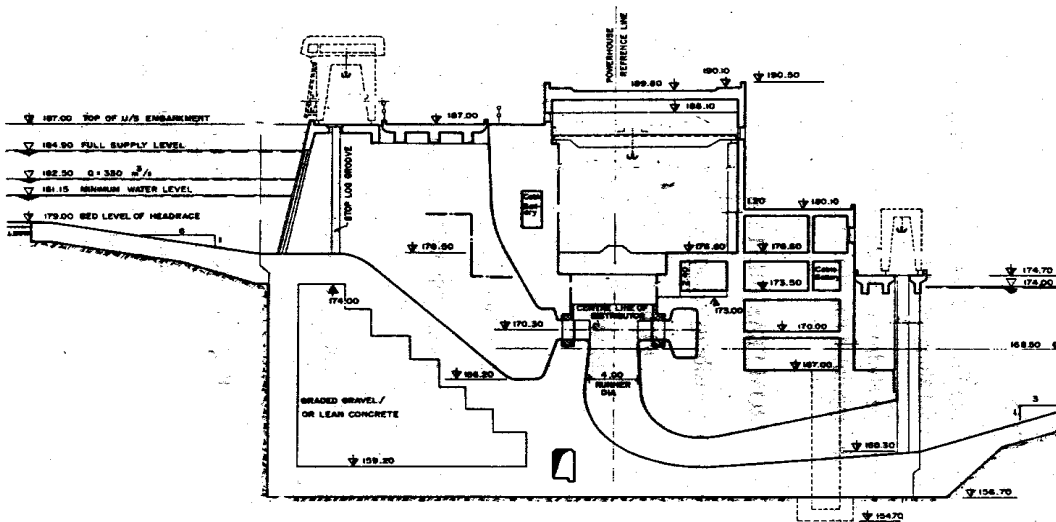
C.J.Link Tail HPP Powerhouse Cross-Section
